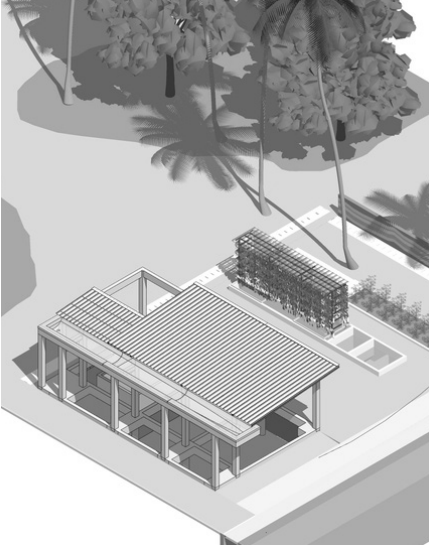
Bare structure on ground floor [Urban Rural Systems, n.d.]
